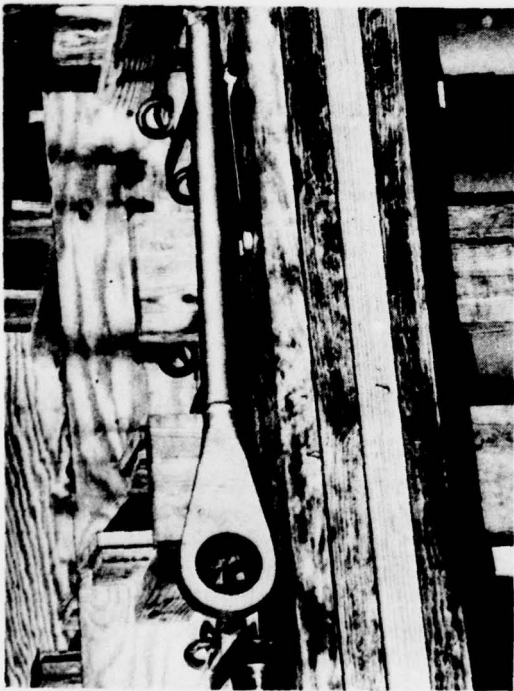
Reversible Ratchet Box Wrench and 1-1/2" Socket Wrench Adapter Shown Separated
